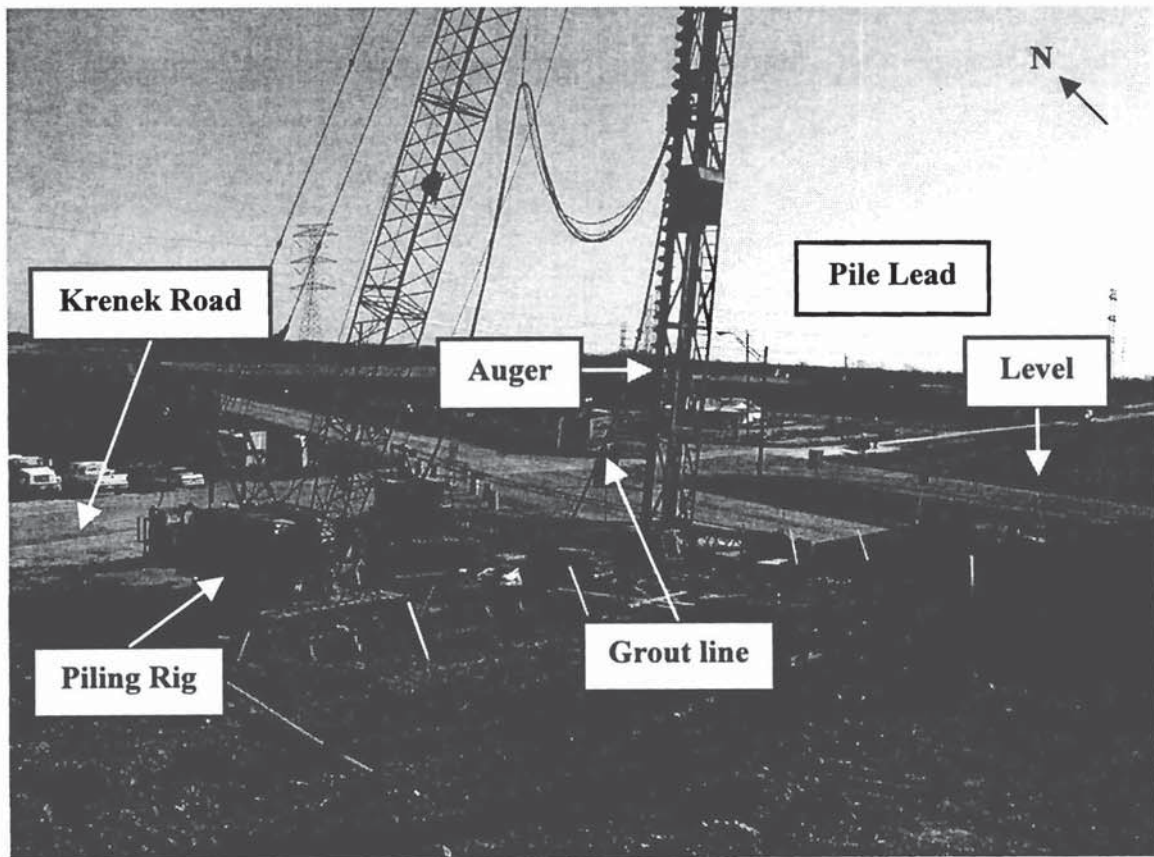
Positioning the Drilling Rig for Installing Abutment Piles
